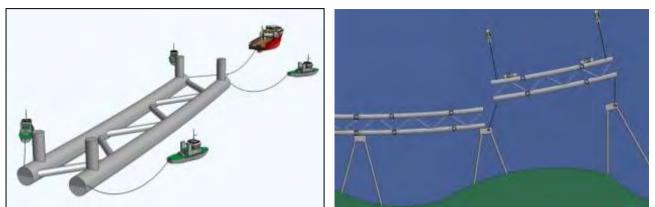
Tow to crossing location (left) and mooring at assembly site (right)
